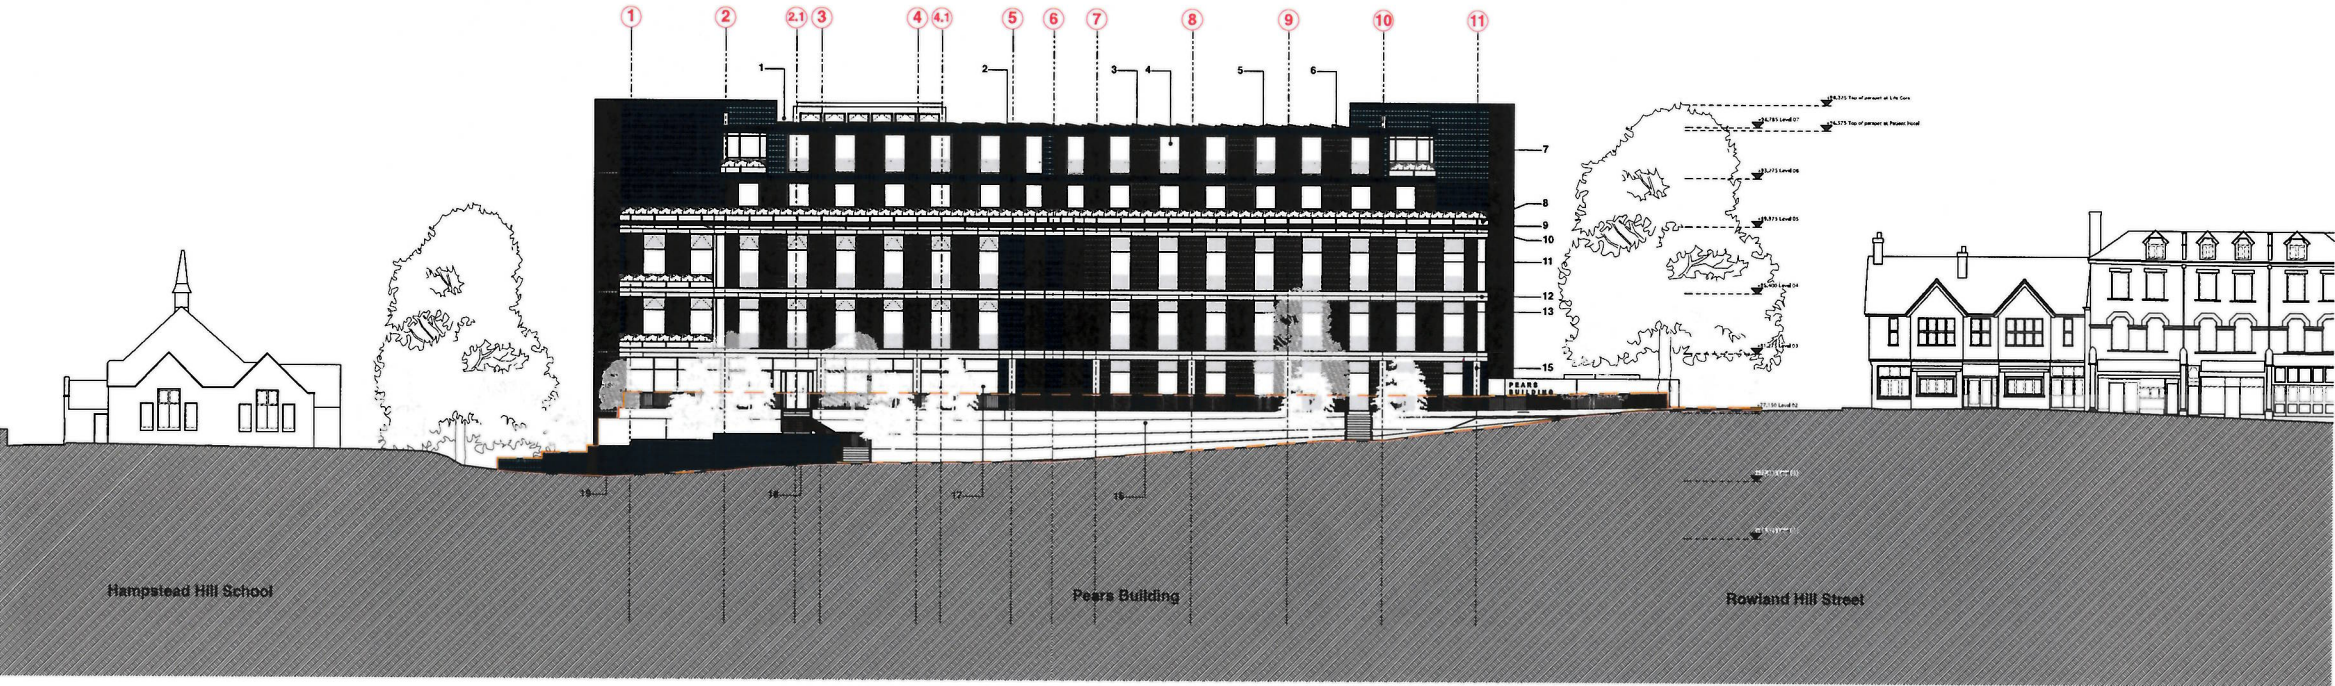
Extract of Section 5.8 of the originally submitted Design and Access Statement - Elevations and Materials
